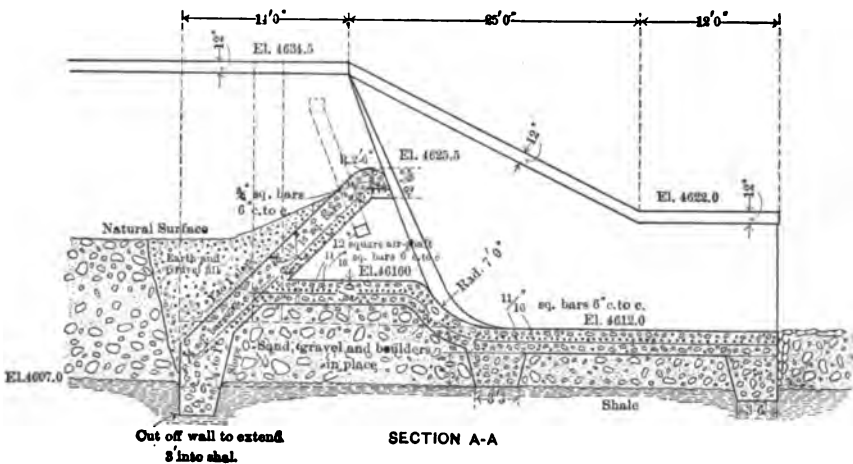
Cross-section of Corbett Weir, Shoshone Project, Wyoming.
